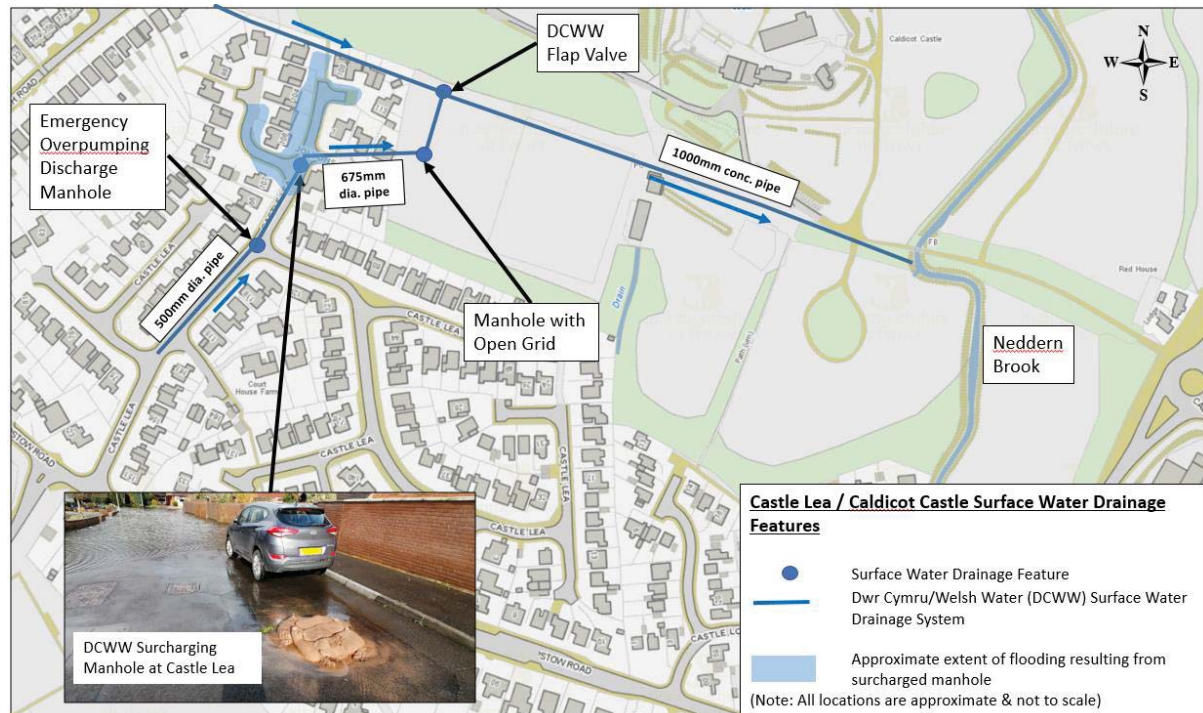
Surface Water Plan Showing Location of Manhole for Pumping
